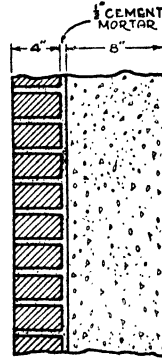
Section through Wall Consisting of 8-inch Concrete, $\frac{1}{2}$ -inch Cement Mortar and 4-inch Face Brick
